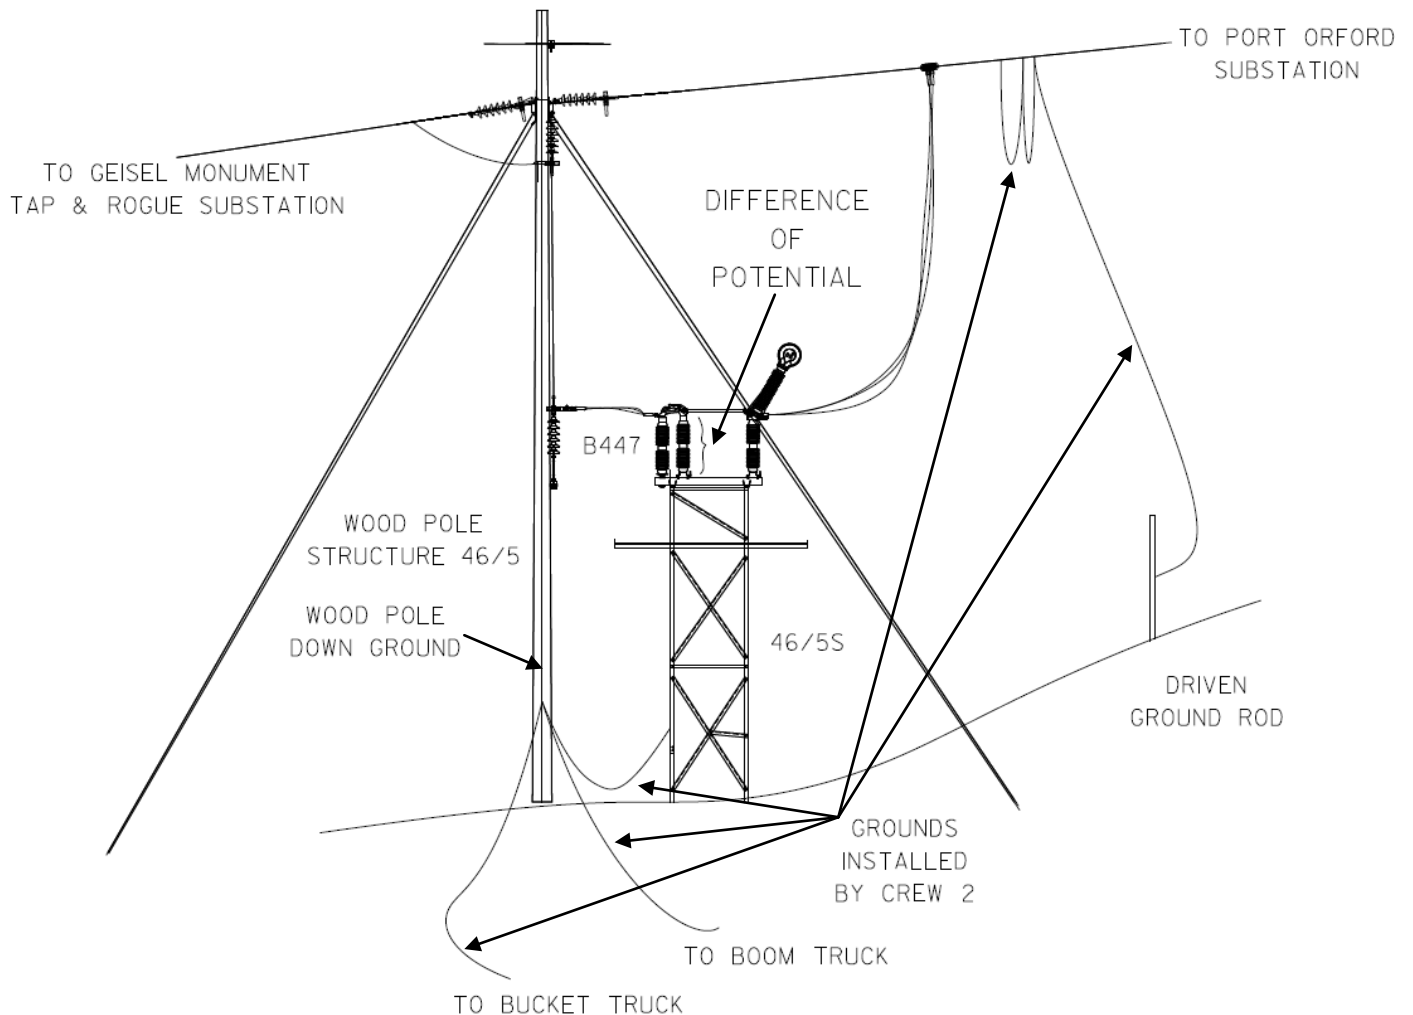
Grounds Installed by Crew 2 at Worksite 46/5
